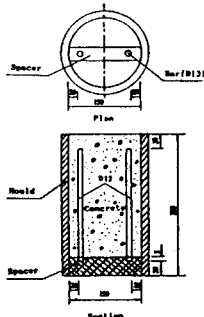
Concrete cylinder mould for corrosion test of reinforcing steel
